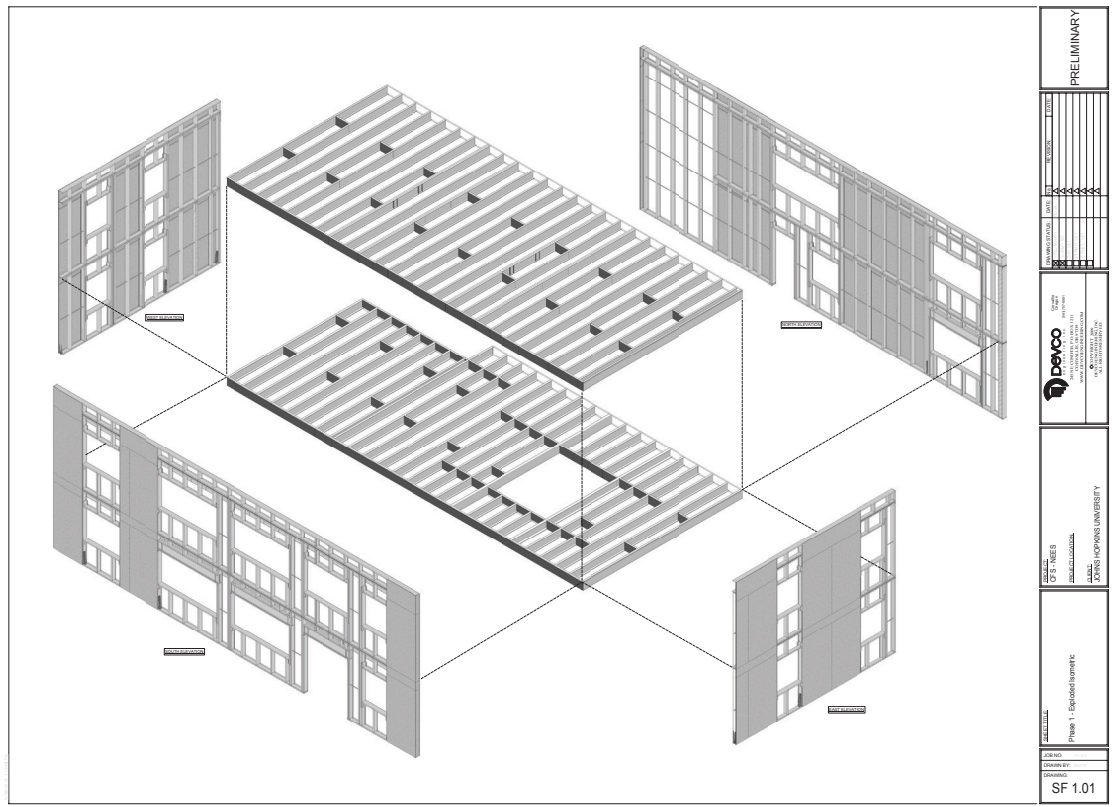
Exploded view of the Phase 1 building specimen, framed only with structural components (drawing by Phil Clark at Devco)
